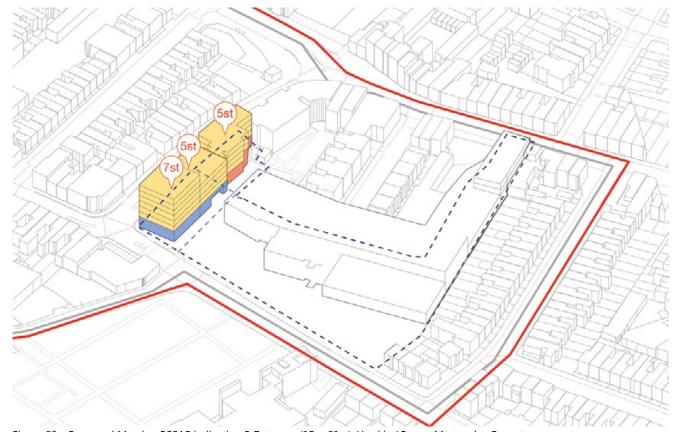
Proposed Massing BSSA5 indicating 5-7 storeys (15m-21m). Hawkins\Brown Masterplan Report
